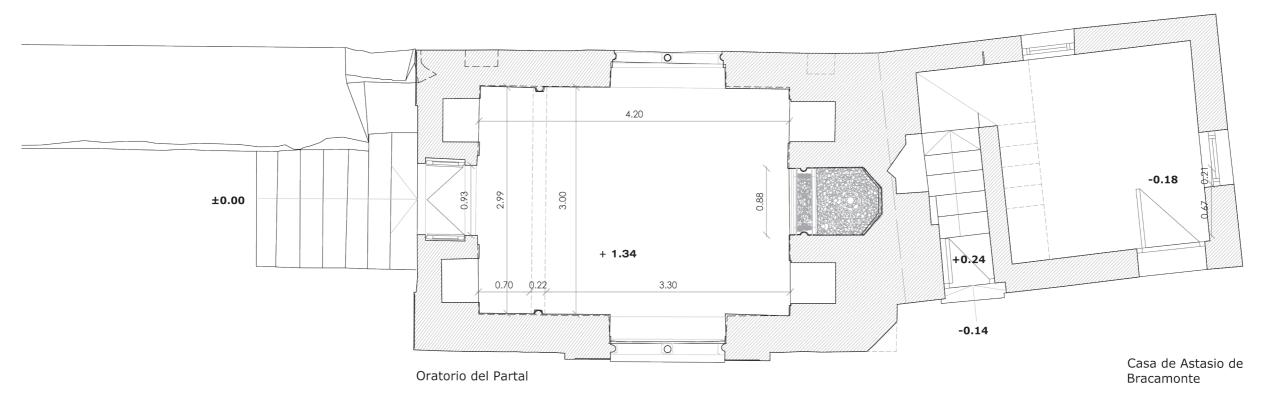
Plan layout of the Oratory (*left*) and the House of Astasio de Bracamonte (*right*) (Wulff 2012).
